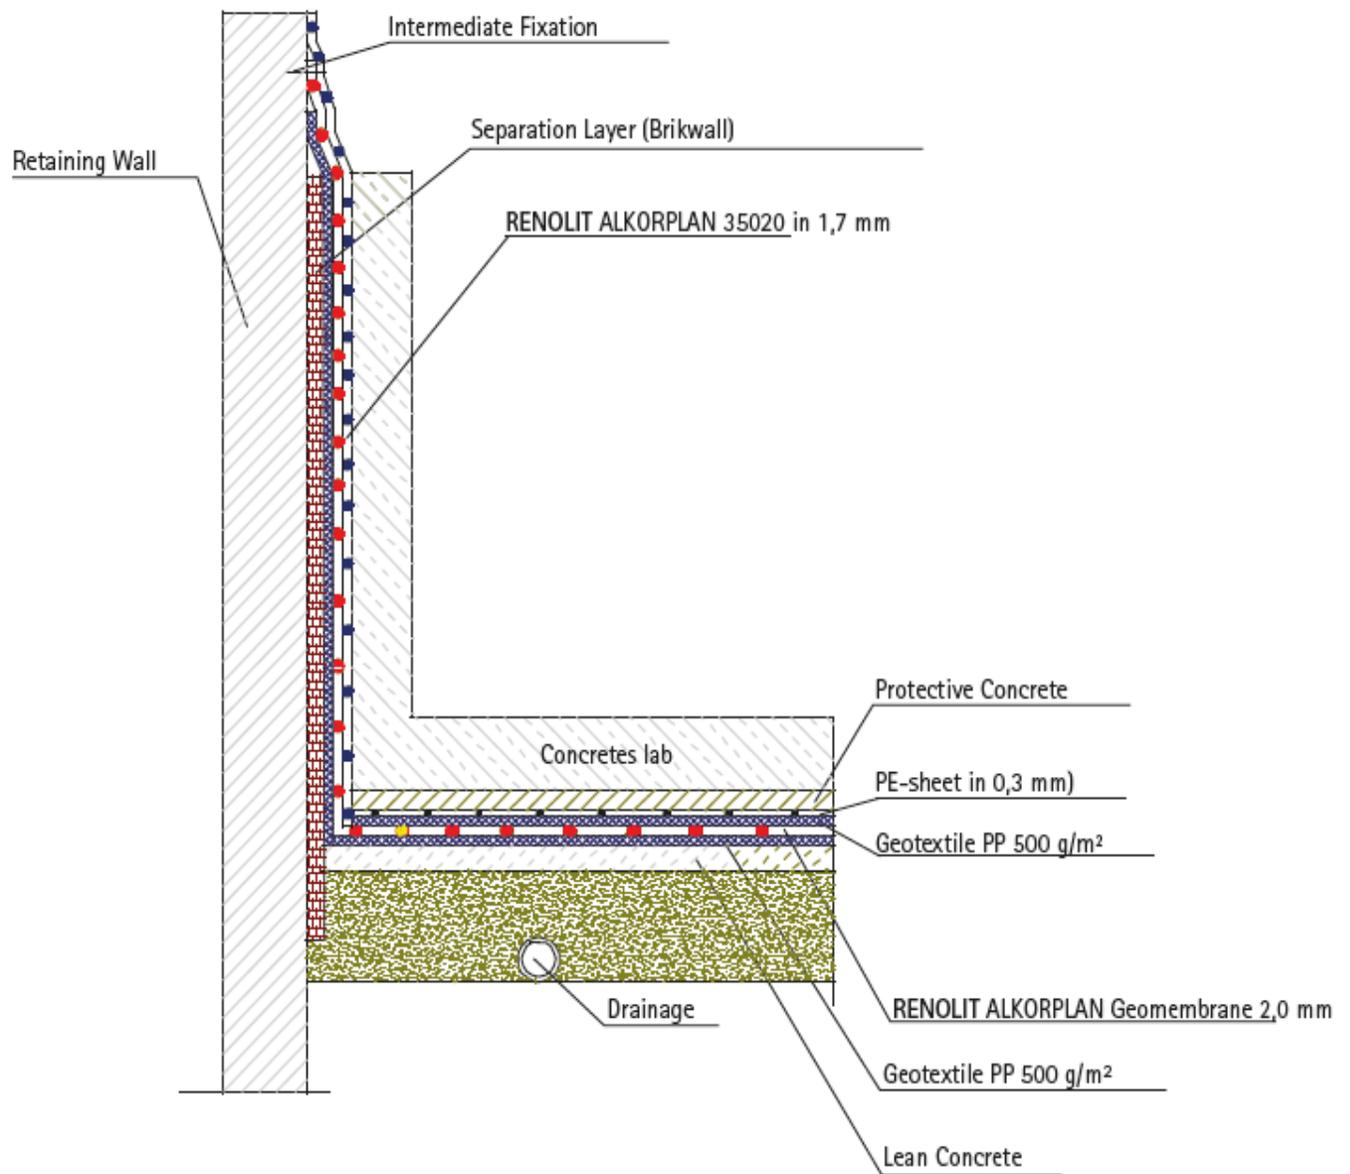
Waterproofing of the vertical wall without working space<sup>[16]</sup>
